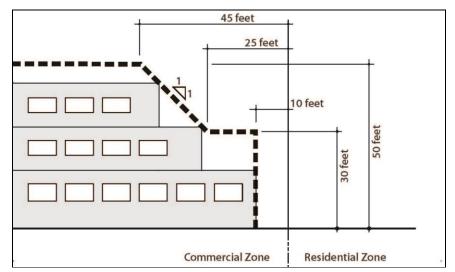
Building Height need to amend showing min. of 35' and max. of 45'
